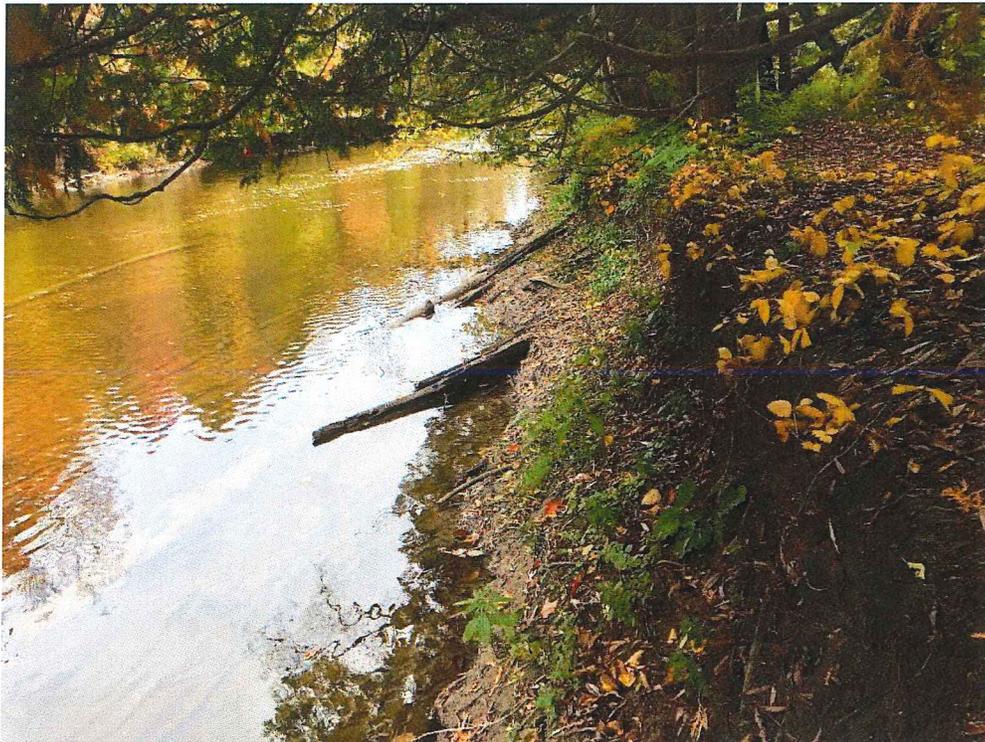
Site photo facing north near the middle of Section D-D. Photograph taken September 29, 2020.
